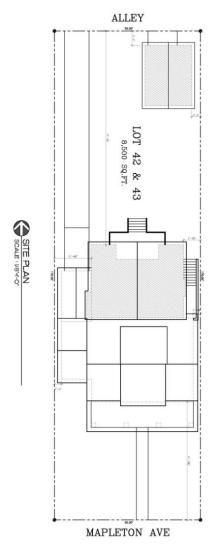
Proposed Site Plan, Dec.3, 2014 (right). Not to scale.
